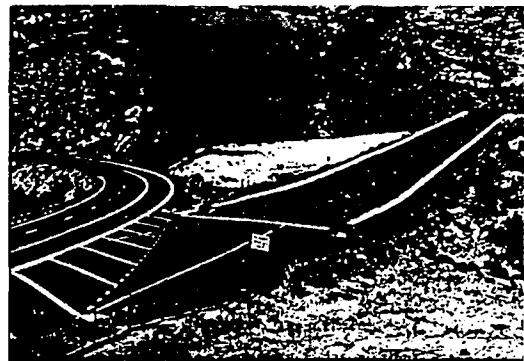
This Arizona site facilitates entry and use by more than one vehicle at a time. Note pavement marking to minimize parking or confusion about the main travel lane direction.
